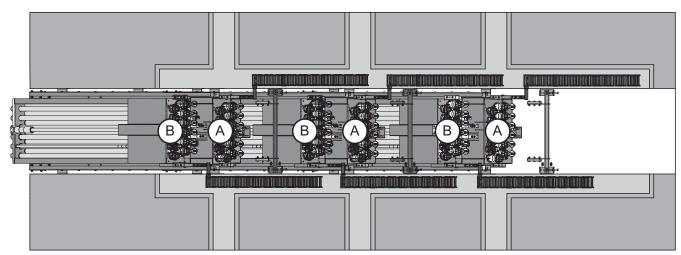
Cable Track Installation on Both Sides of UV Channel - Method A
